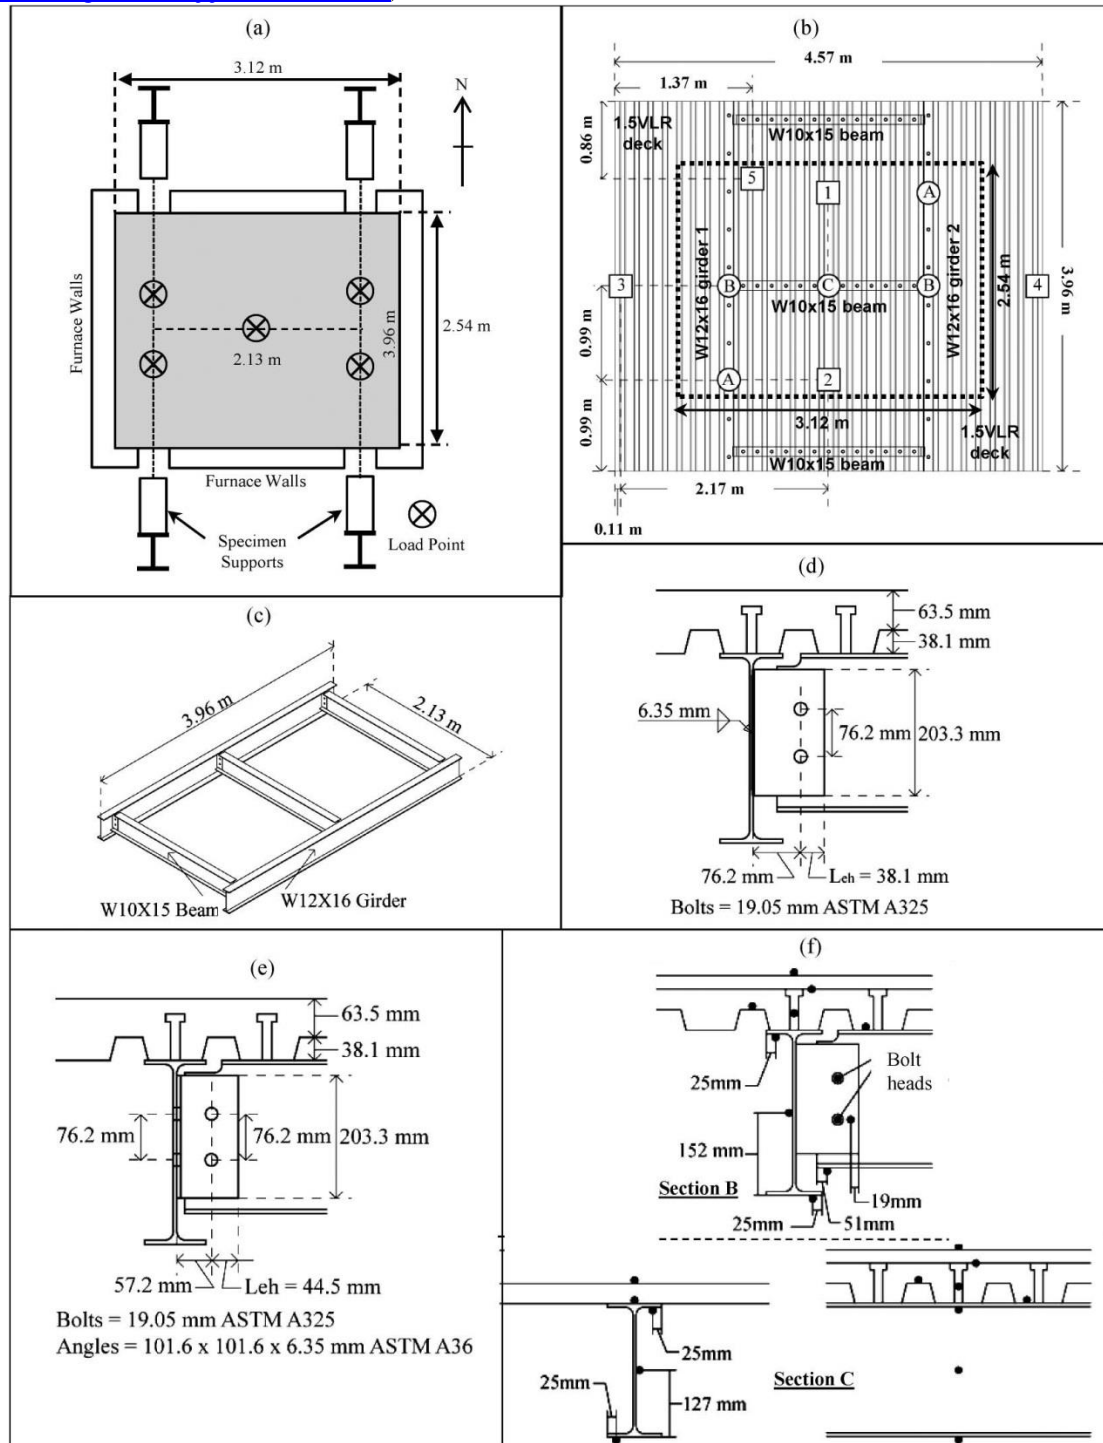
Details of the furnace testing facility and tested assemblies: (a) furnace floor plan; (b) composite slab floor plan; (c) composite slab beam-girder assembly; (d) shear tab connection in composite slabs FA-1 and FA-2; (e) double-angle connection in composite slab FA-3; (f) thermocouple locations
